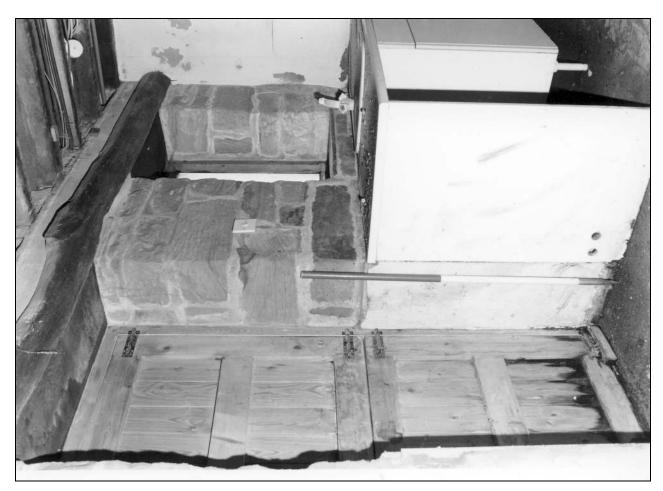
Rear wall of kitchen, from the south-west (film 2, frame 5)
